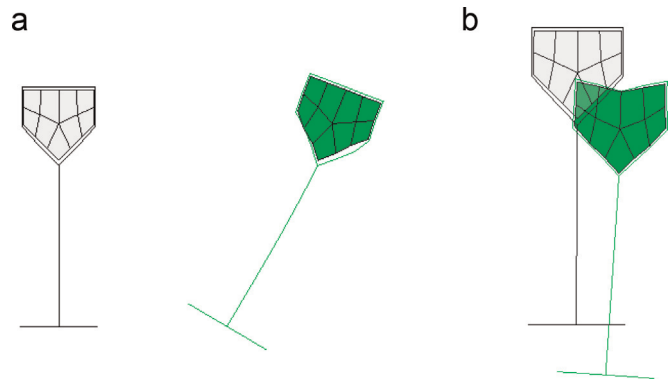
Buckled/deformed and undeformed shapes at mid-span for BWS.
